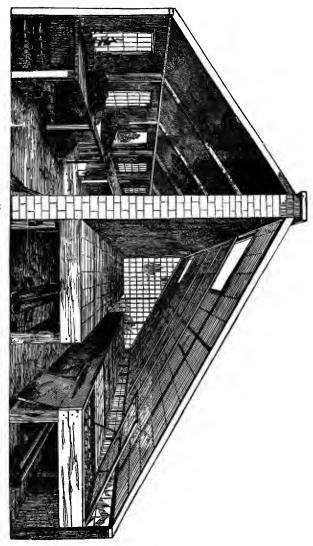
LEAN-TO PROPAGATING HOUSE.
